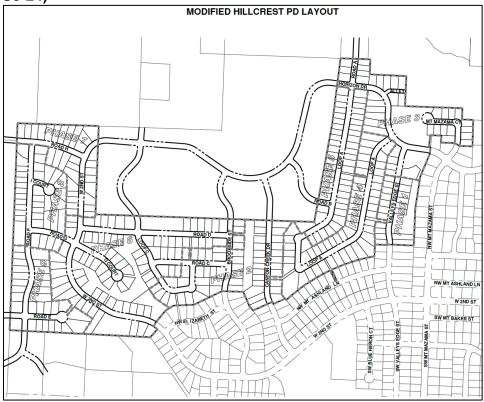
Plan as Proposed with Planned Development Amendment (PDA 1-24/ S3-24)
